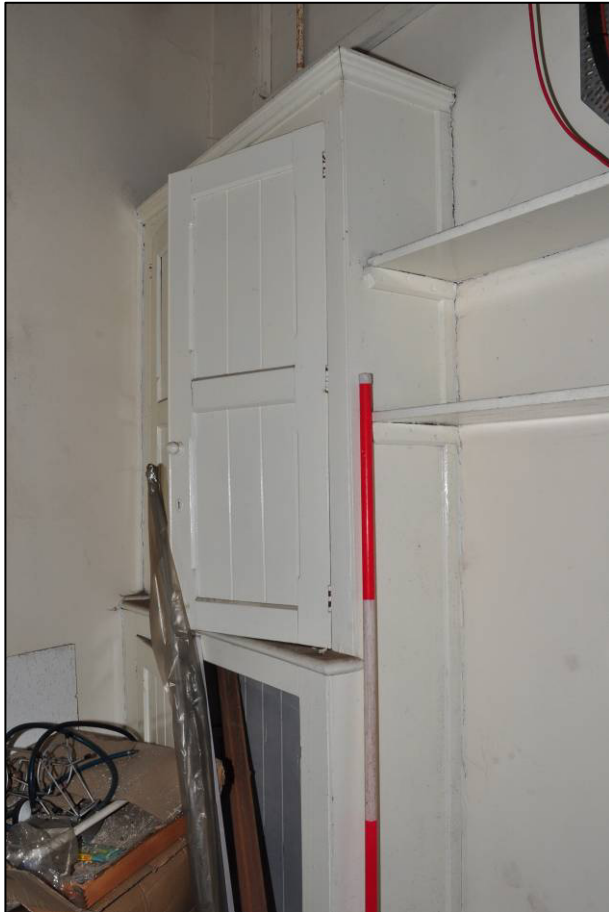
1879 Board School, storage room (1F8), cupboard and shelving to east wall, looking SE (photo 2485).
